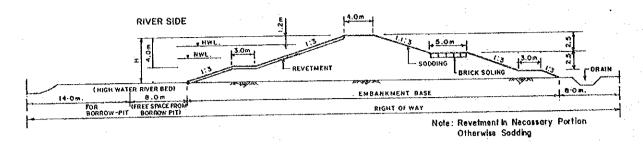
(3) LONGITUDINAL SECTION OF EMBANKMENT : DHAKA EAST (SA, SB AND SC)
